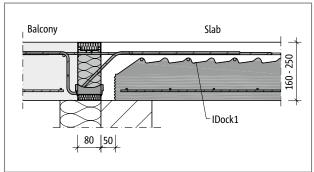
Schöck Isokorb® T type K-E: Connection of balconies with slab thicknesses of 160 mm to 250 mm with IDock1
